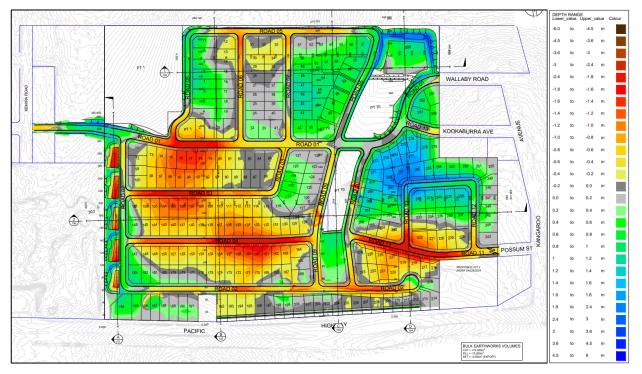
Bulk Earthworks Plan (Barker Ryan Stewart, 2025)
